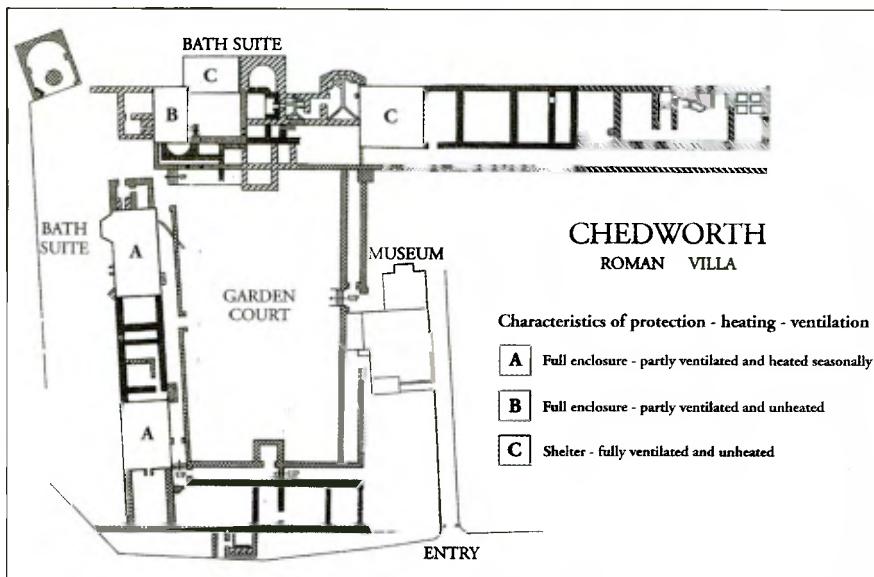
Plan of the villa's protective structures with their different configurations of heating and ventilation.
